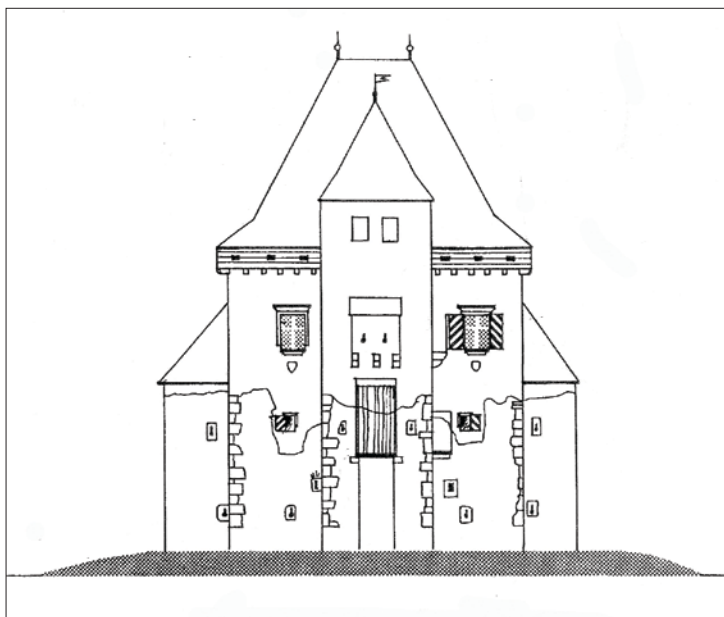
Konjščina castle, west facade reconstruction (situation at the beginning of the 16th century): notice numerous pears-shaped gun loops (drawing by: Z. Horvat)
